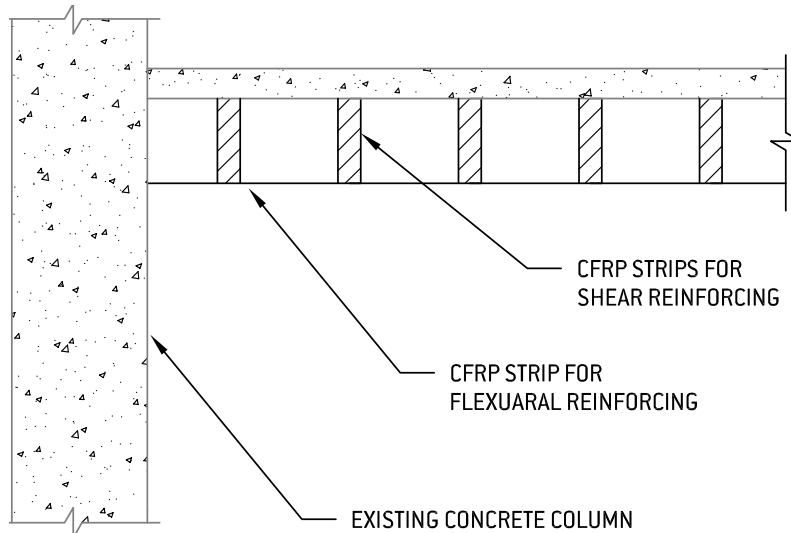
Concrete Beam Reinforcing Detail for Shear and Bending (Manufacturer and Material Information Intentionally Omitted)
